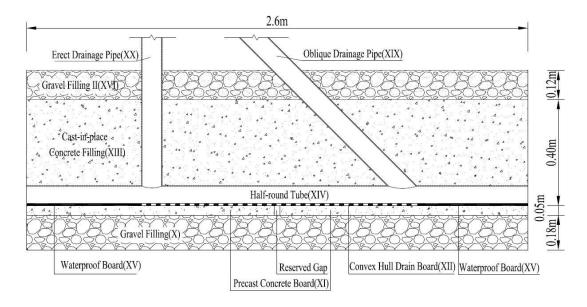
Sketch of the simulating tunnel invert structure and drainage system in the testing
